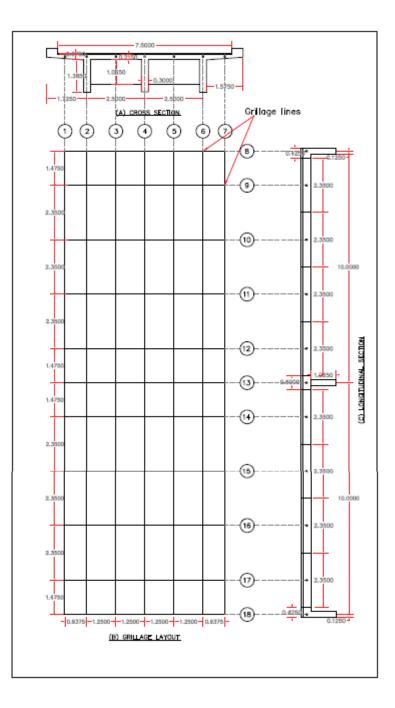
Grillage Layout for 20m span two lane bridge with 3 cross girders
